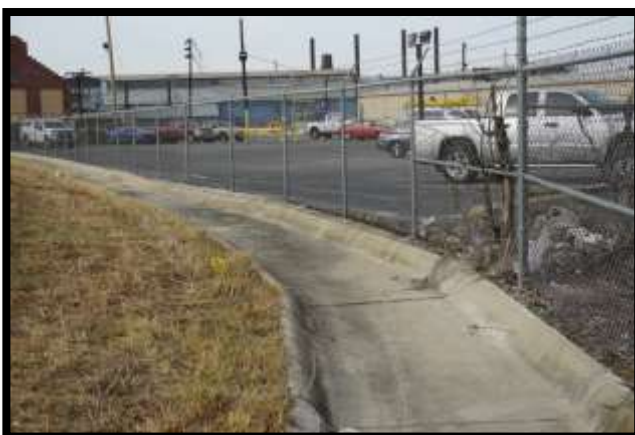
Concrete drainage swale, north side of Taracorp pile (view southeast).
